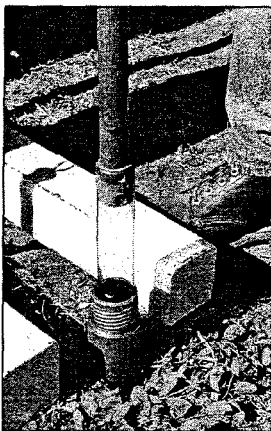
Lower liner to bottom of outer casing on leading end of inner rods.
